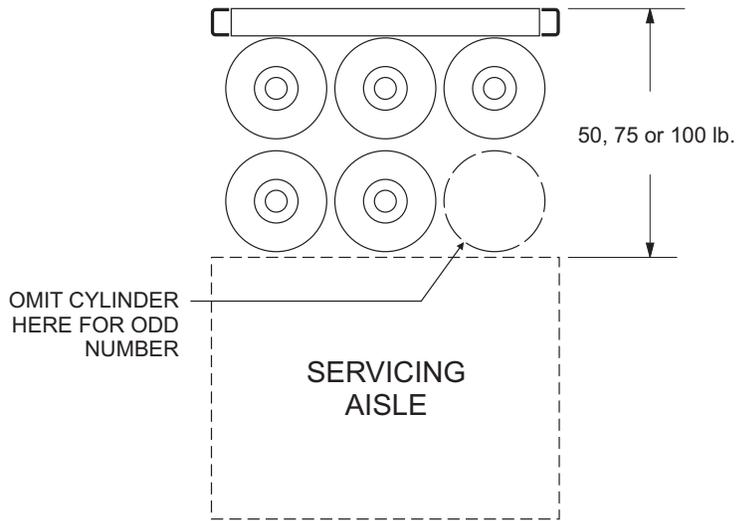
Multiple Cylinder Mounting, Arrangement C
